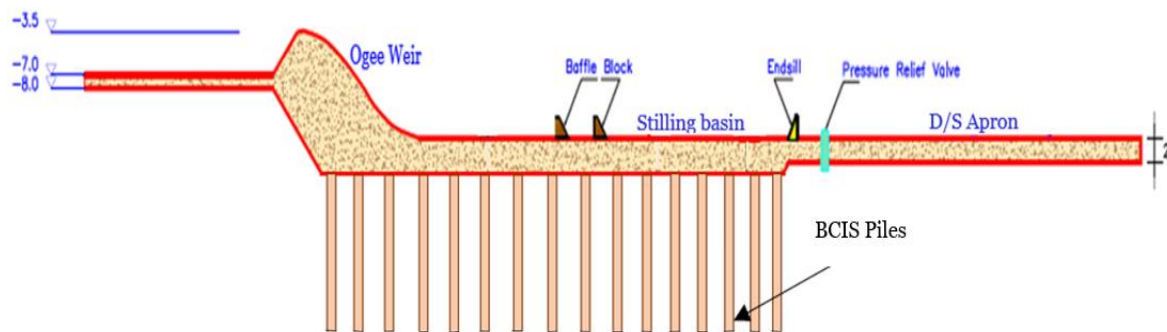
Schematic diagram showing pile foundation under stilling basin
